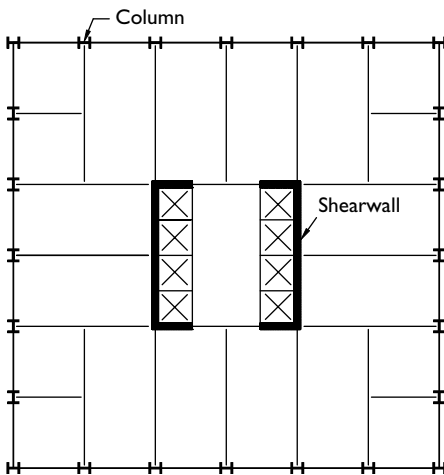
Typical floor plan of a composite building with shearwall–frame interaction system.
